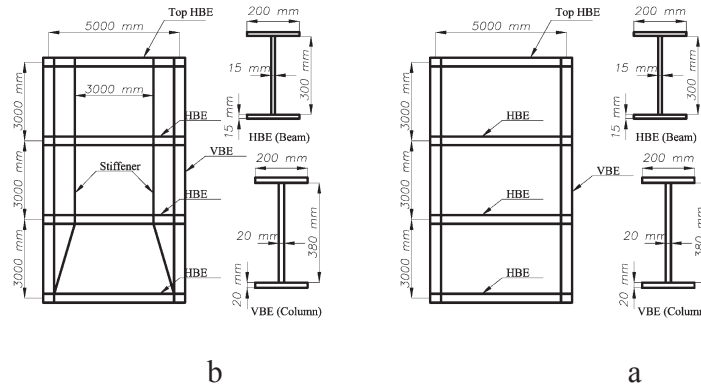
Steel plate shear wall a) Shear wall sample without stiffener b) Shear wall sample with the proposed stiffener
